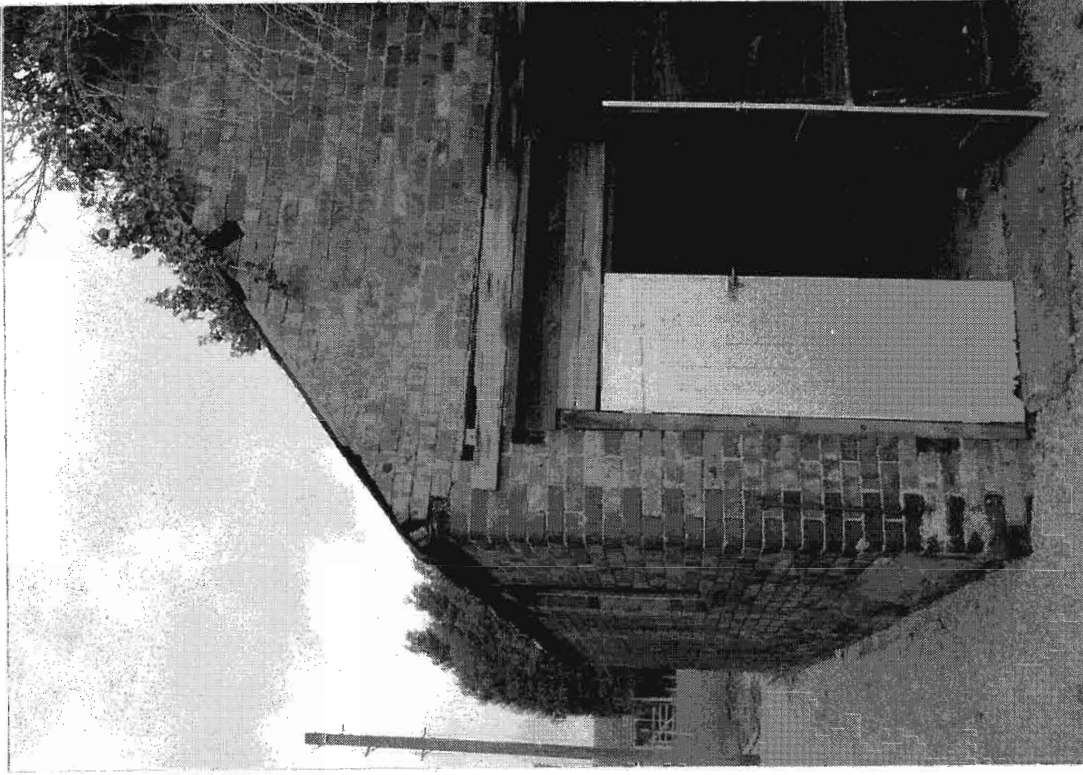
Detail of part of the south-east gable of the outbuilding, showing bull-nose bricks at the corner. All the brickwork visible is late 19th century in origin and comes from the 'Haunchwood' brickyards.
